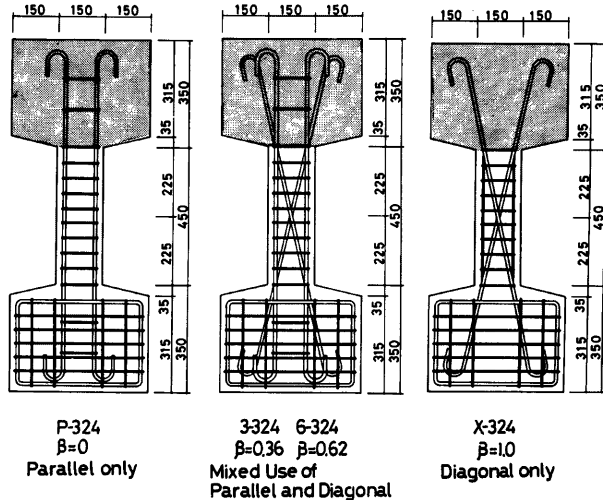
Principal dimensions and reinforcement details (Units; mm).
